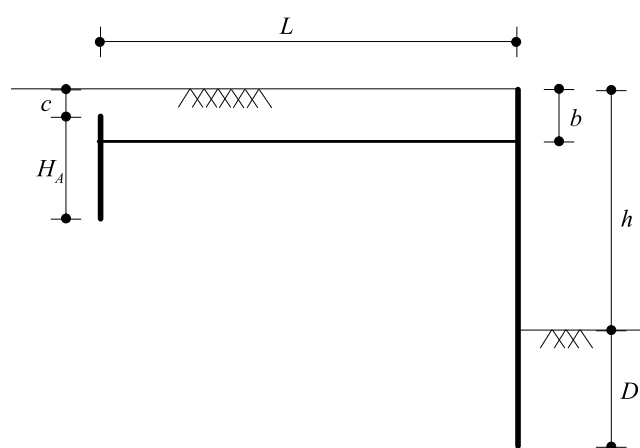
(a) Layout of the wall-anchor system in the centrifuge tests
